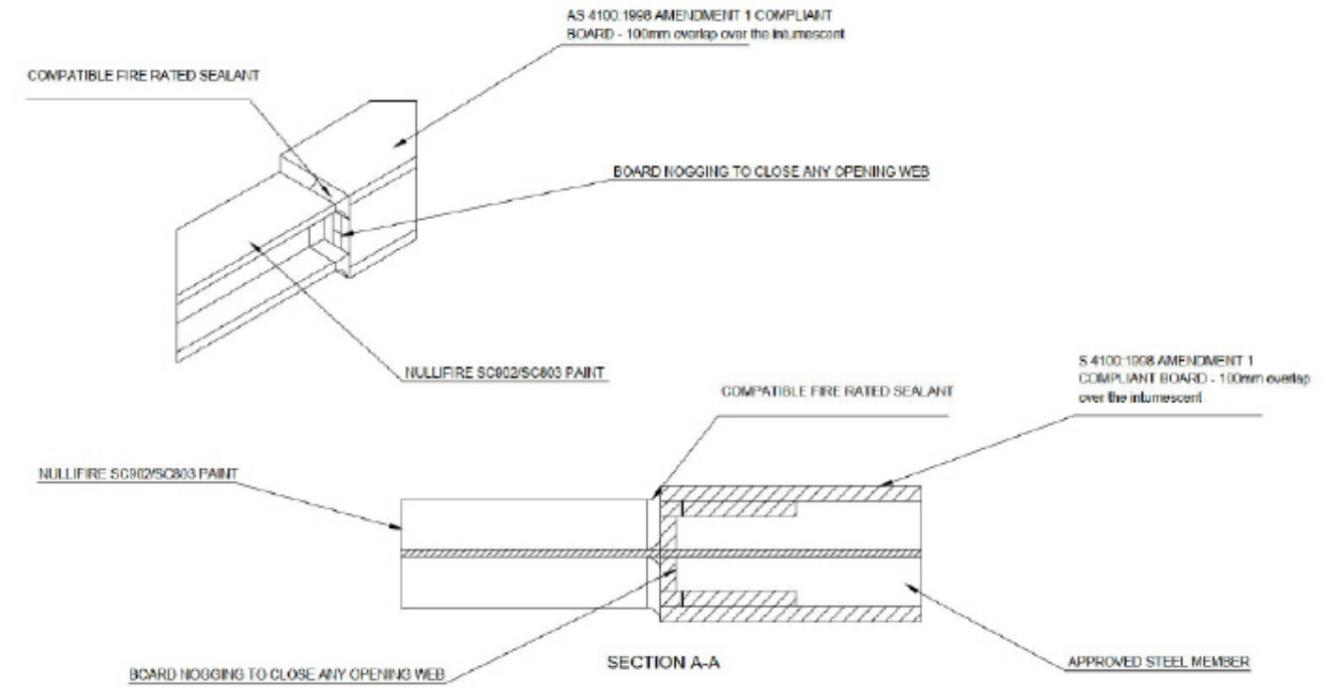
The construction detail when the board protection system is added next to the Nullfire intumescent coating
